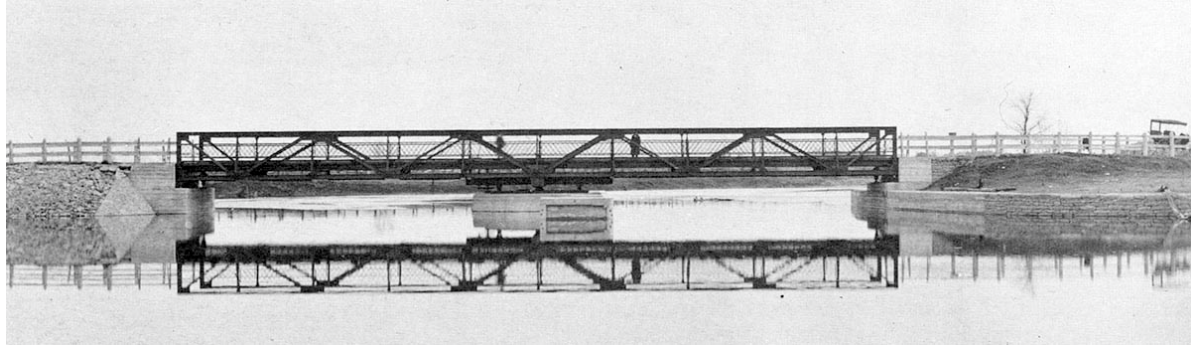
Boundary Road Bridge 1920. [Angus, 2000]
